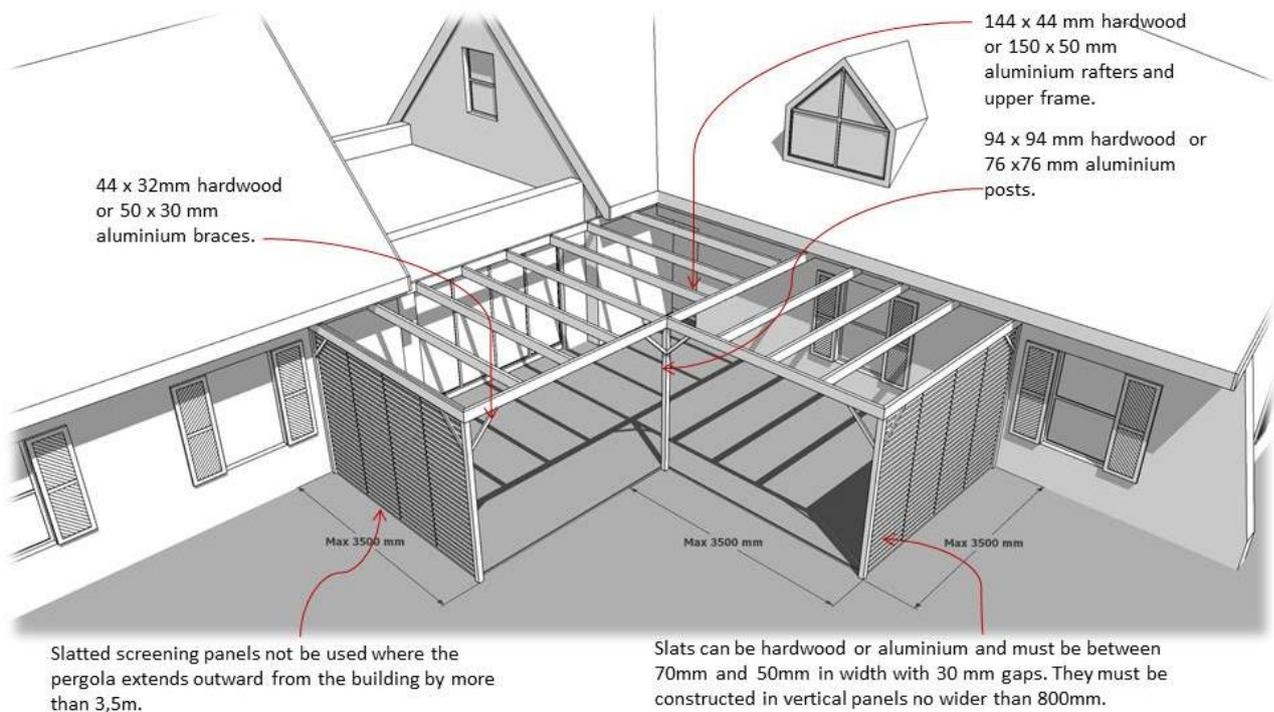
Typical pergola on the street side with timber or aluminium lattice screens incorporated.
